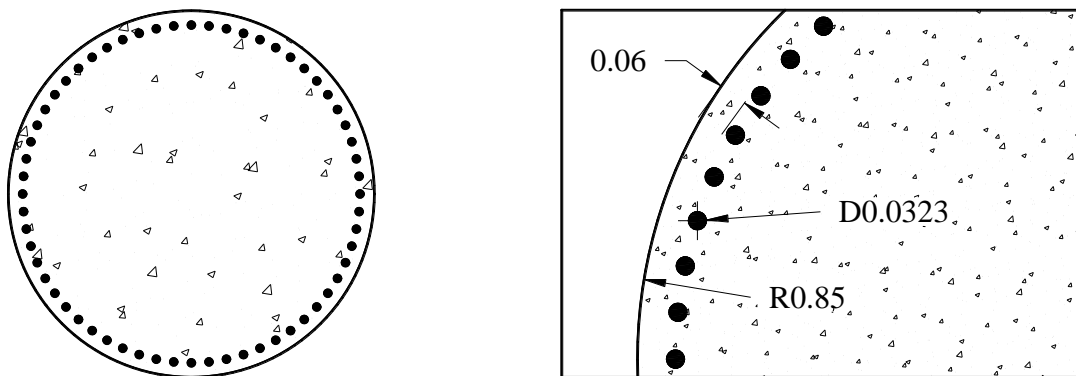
Cross-section of the pier of Bridge A with the 60 reinforcing bars. Units in meters.
